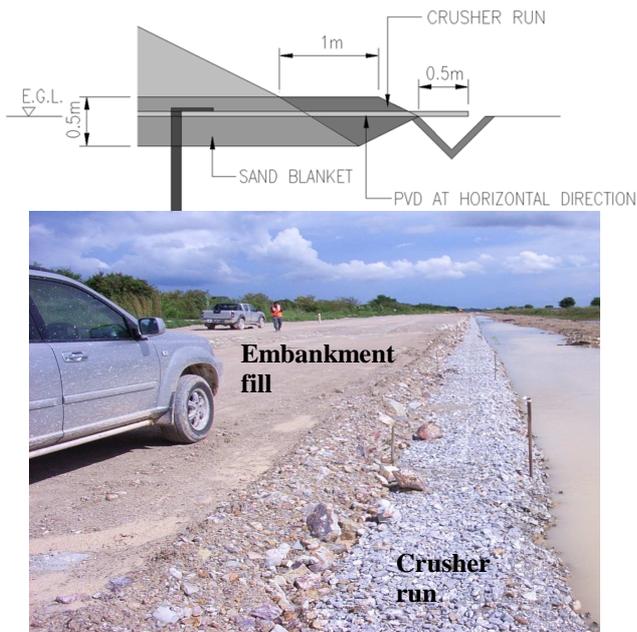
Details of Discharge Outlet for Sand Blanket Connecting All PVD
